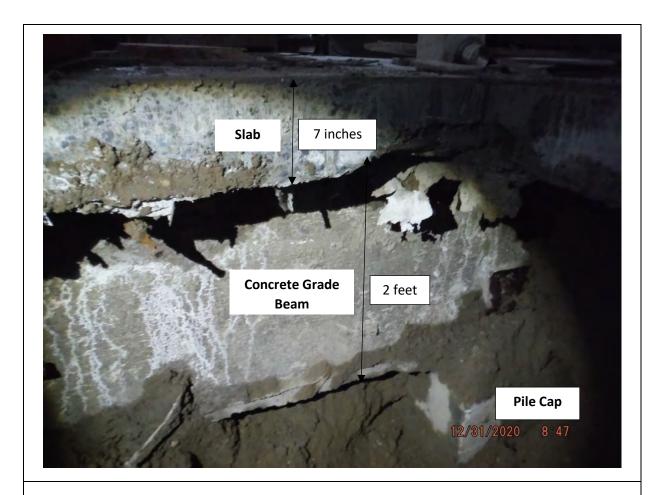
Slab and grade beam observed at Test Pit TP-2 (Pile 101)
